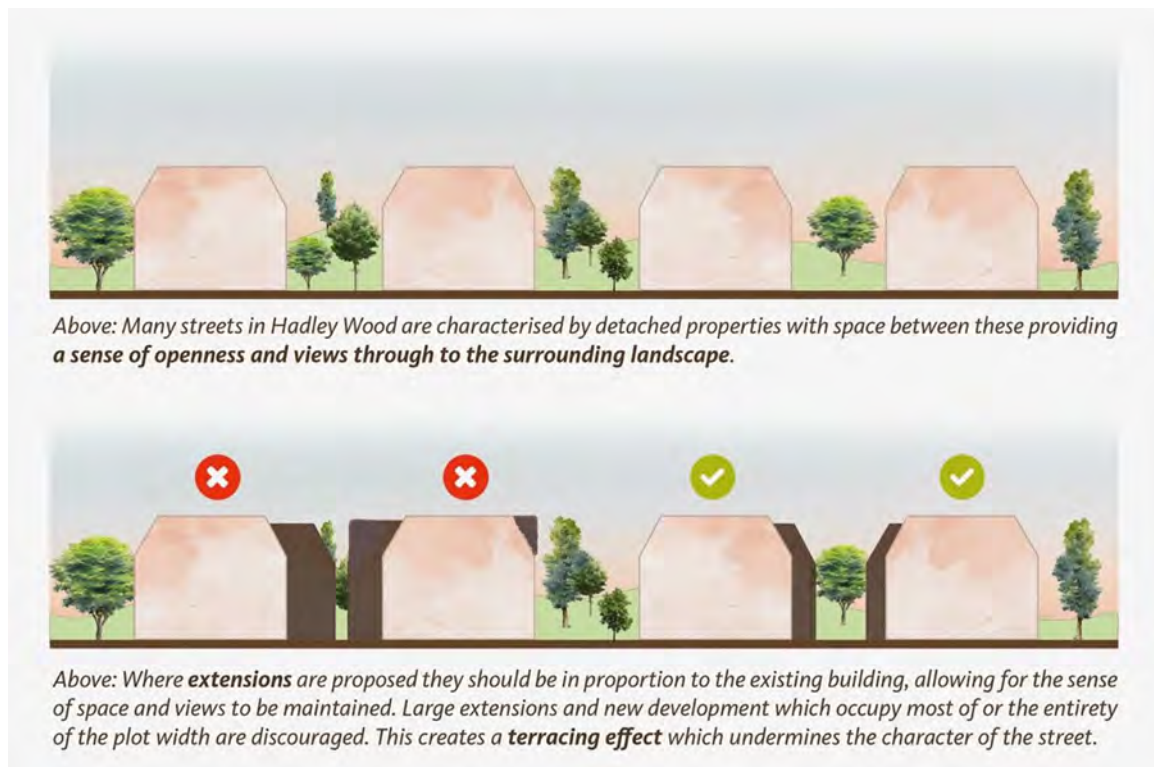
Proposals for development in Hadley Wood, either new development or extensions, should avoid creation of a terracing effect and maintain views between properties. (source: Troy Planning)
